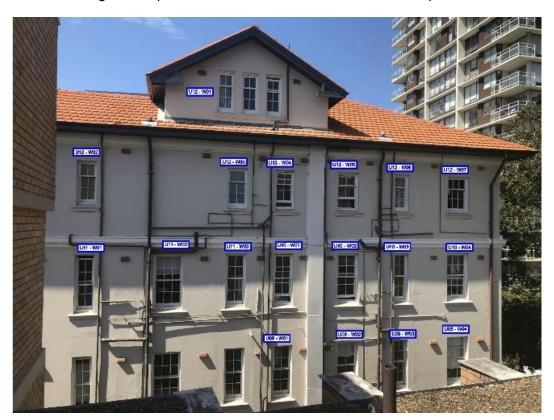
Windows located on northern elevation of Darnley Hall, viewed from the location of the proposed addition identifying the windows under shadow assessment.
